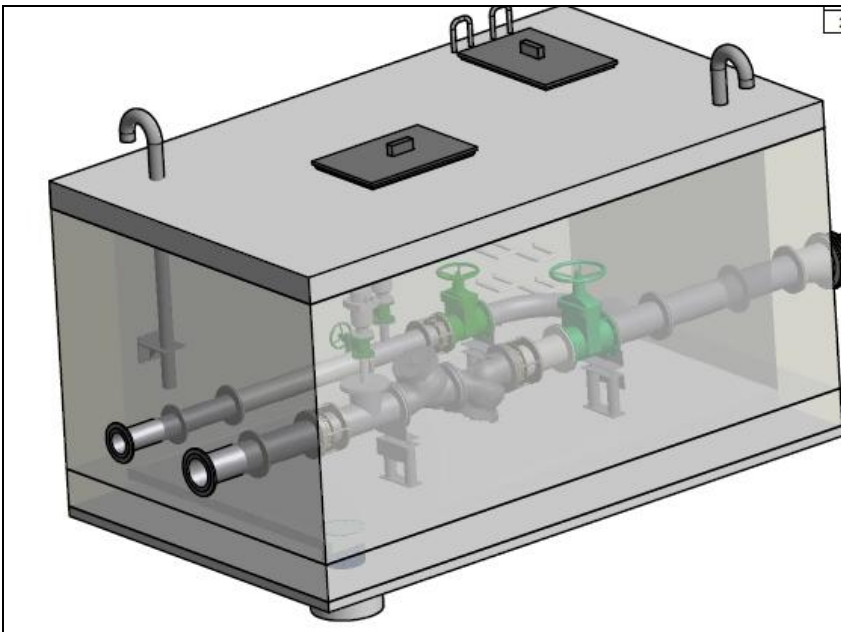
Isometric view of the proposed Pressure-Reducing Valve Chamber (PRV)
